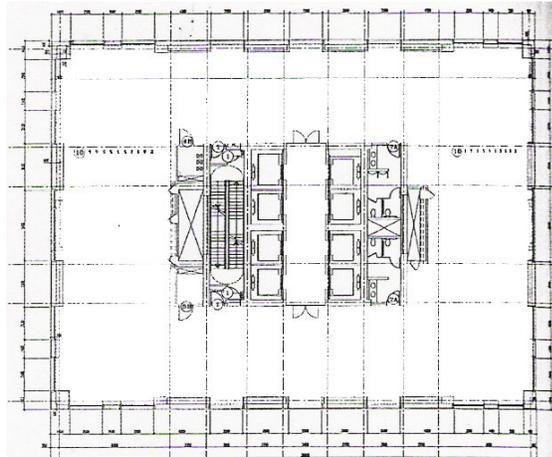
2-14 floors plan of Tekfen Tower (Swanke Hayden Connell Architects. (2003). "Tekfen Tower Levent İstanbul." *Yapı*, 264. p. 92.)
